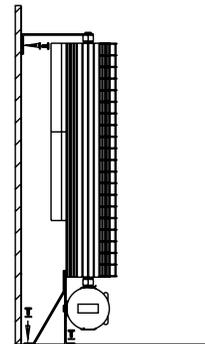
ATTACH HEATER TO FLOOR AND WALL
